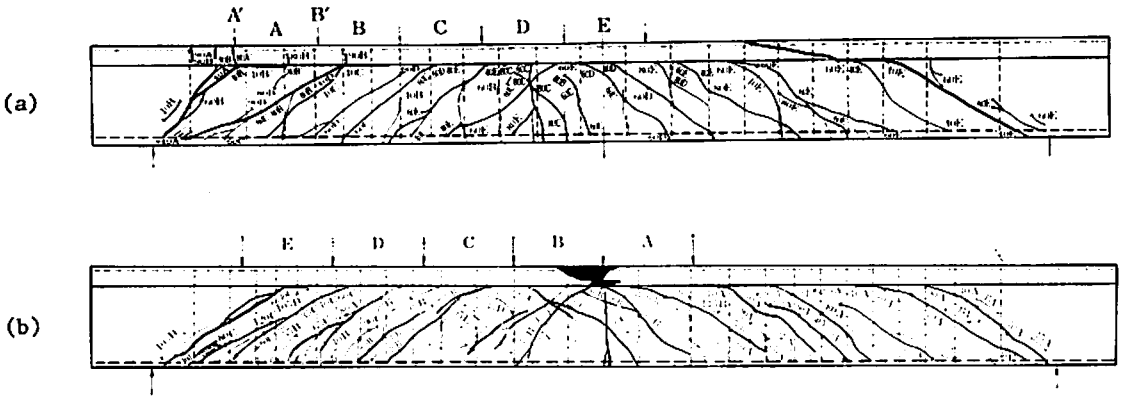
Crack pattern and cracking loads. Numbers indicate the cracking loads in ton. The letters indicate the loading positions. (a) the first beam, (b) the second beam.
